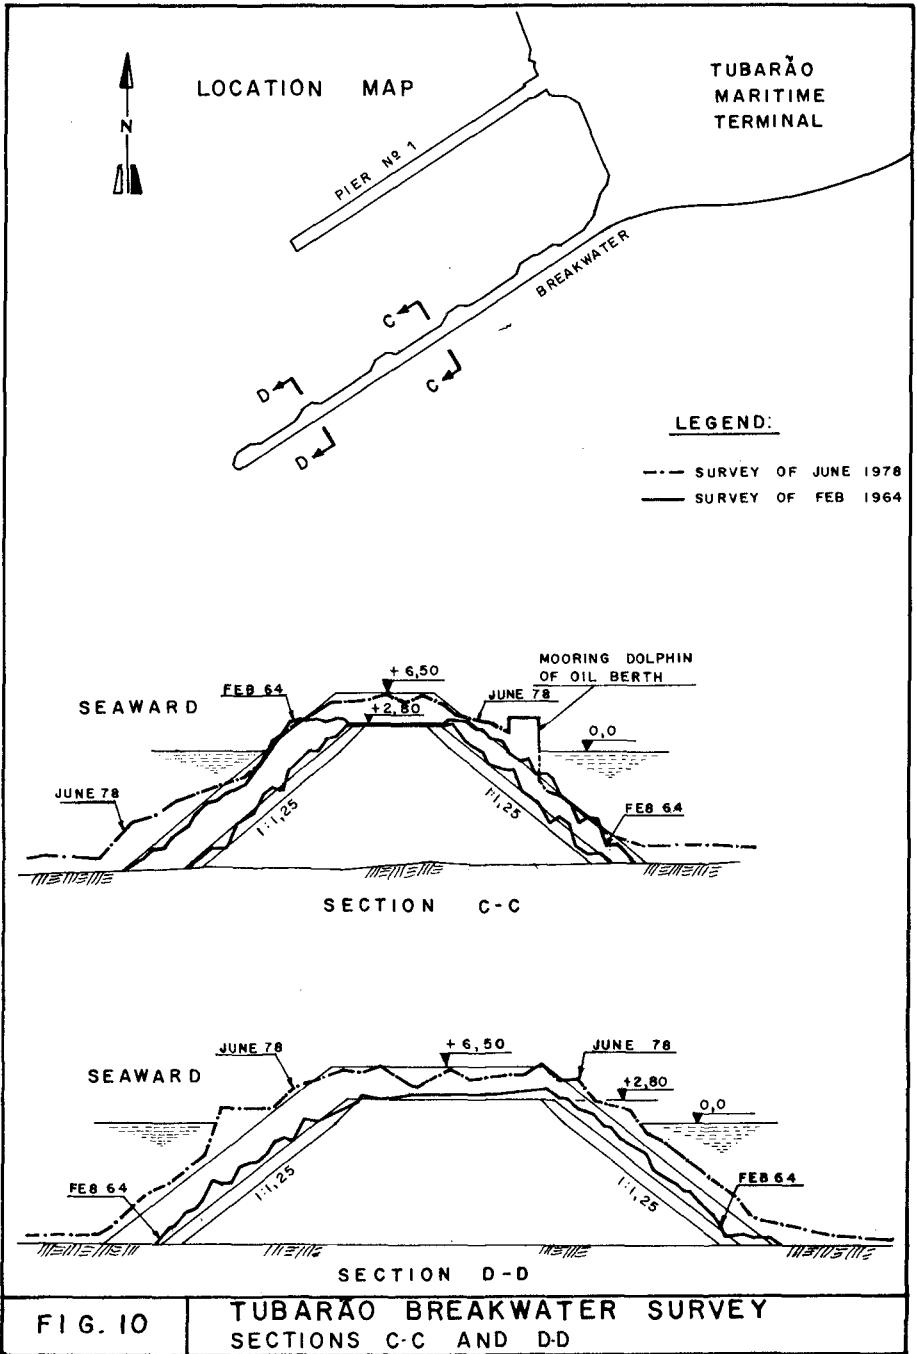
TUBARÃO BREAKWATER SURVEY SECTIONS C-C AND D-D
